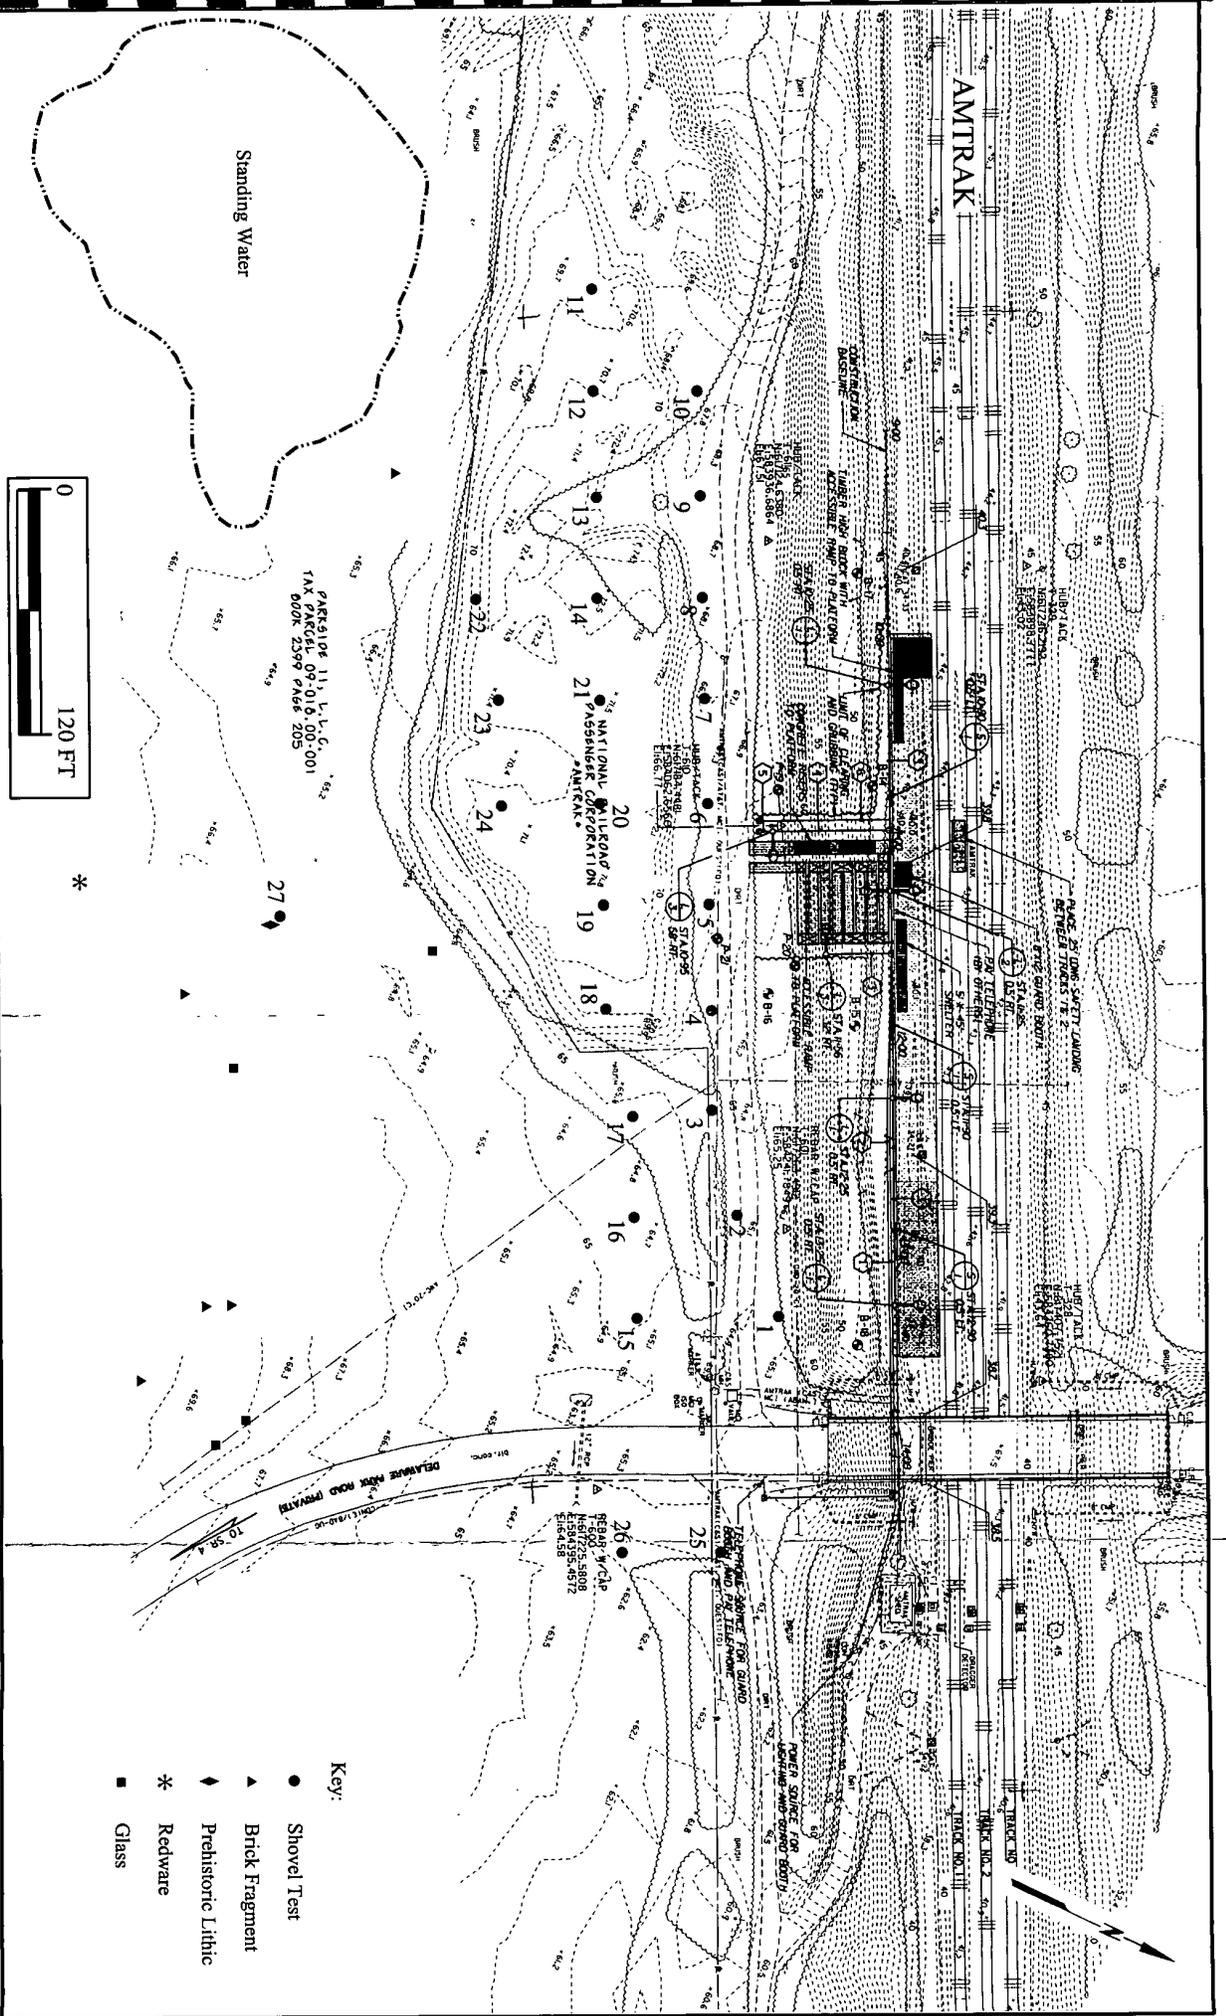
Churchman's Crossing Commuter Rail Station Site Plan Showing Locations of Surface Finds and Subsurface Tests.
